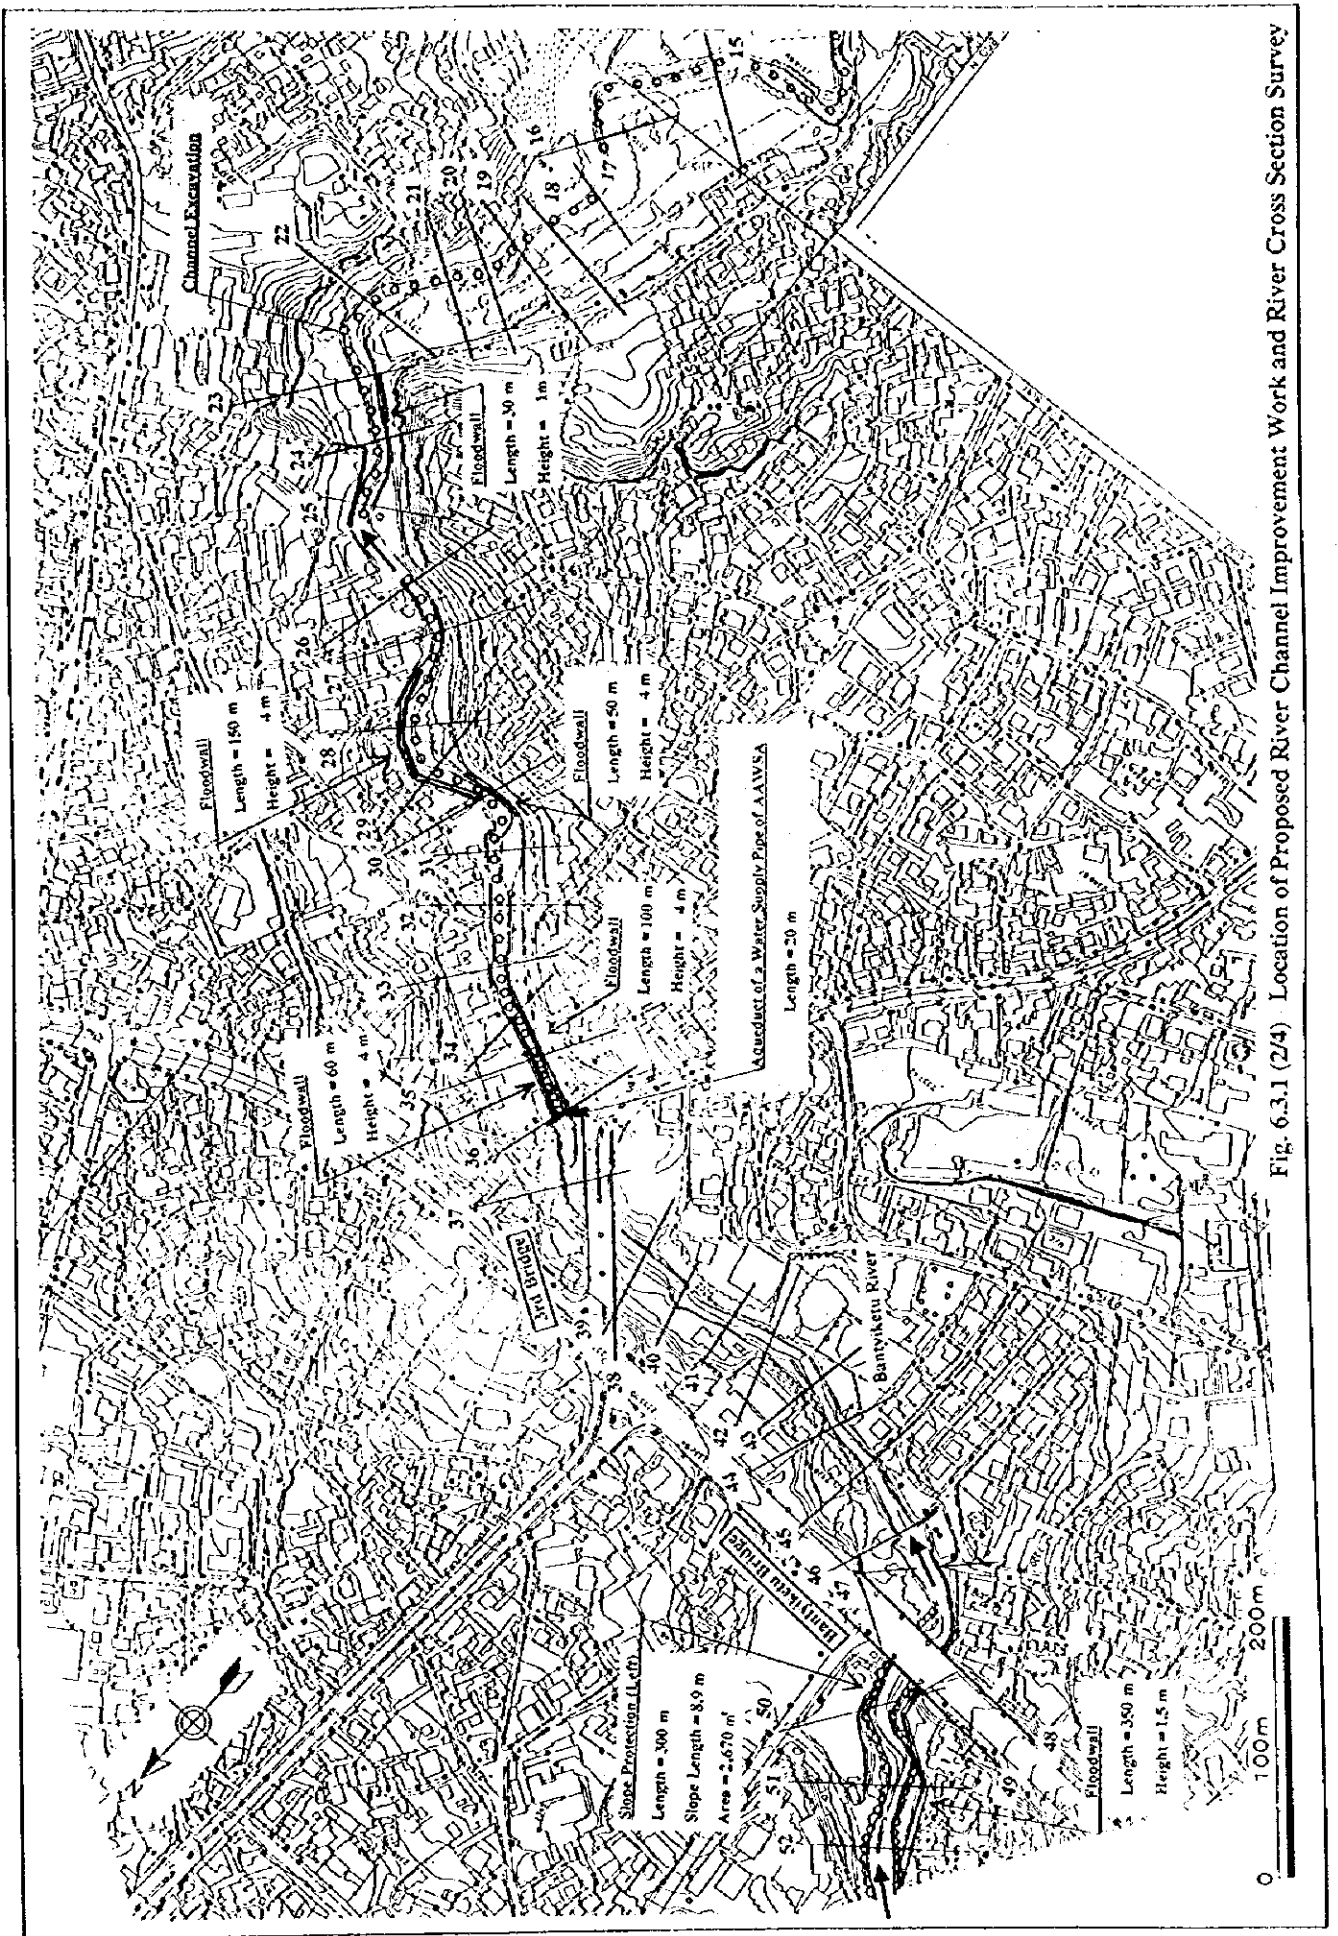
(2/4) Location of Proposed River Channel Improvement Work and River Cross Section Survey
